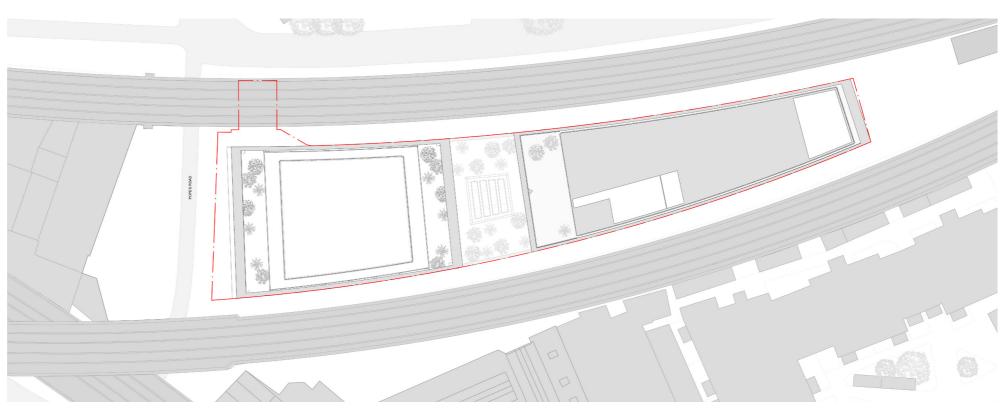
July 2020 Planning Addendum site plan
